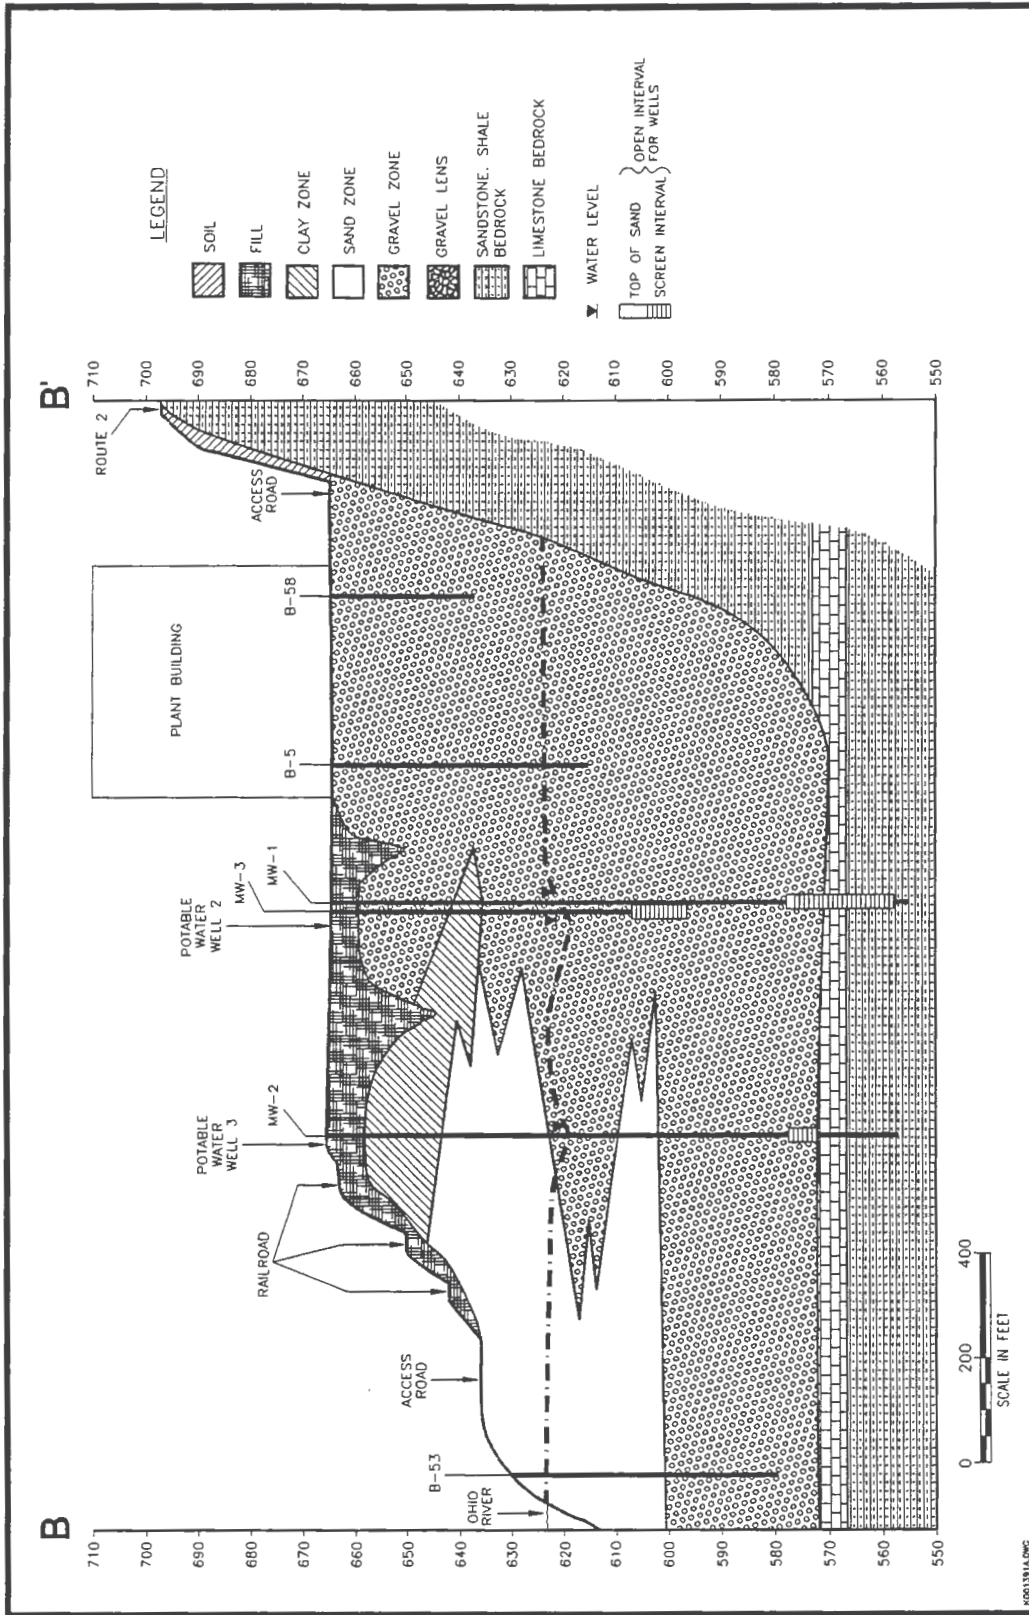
Geologic cross-section B-B' at the Mitchell Plant site.
